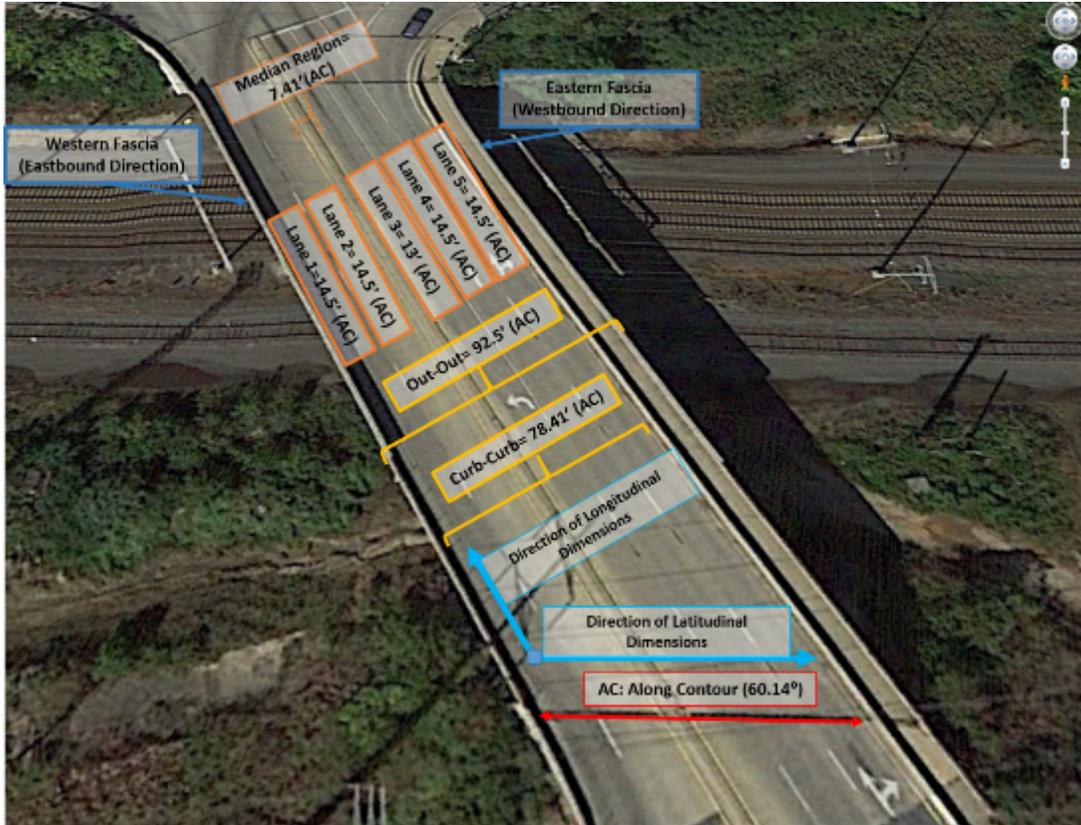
Edgemoor Road over Amtrak and Norfolk Southern Bridge; Latitudinal Dimensions, Pre-Construction Image
